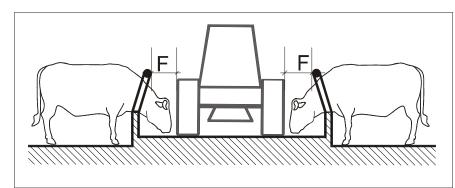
Feed alley dimension for tractors, block-cutter, mixer wagon
